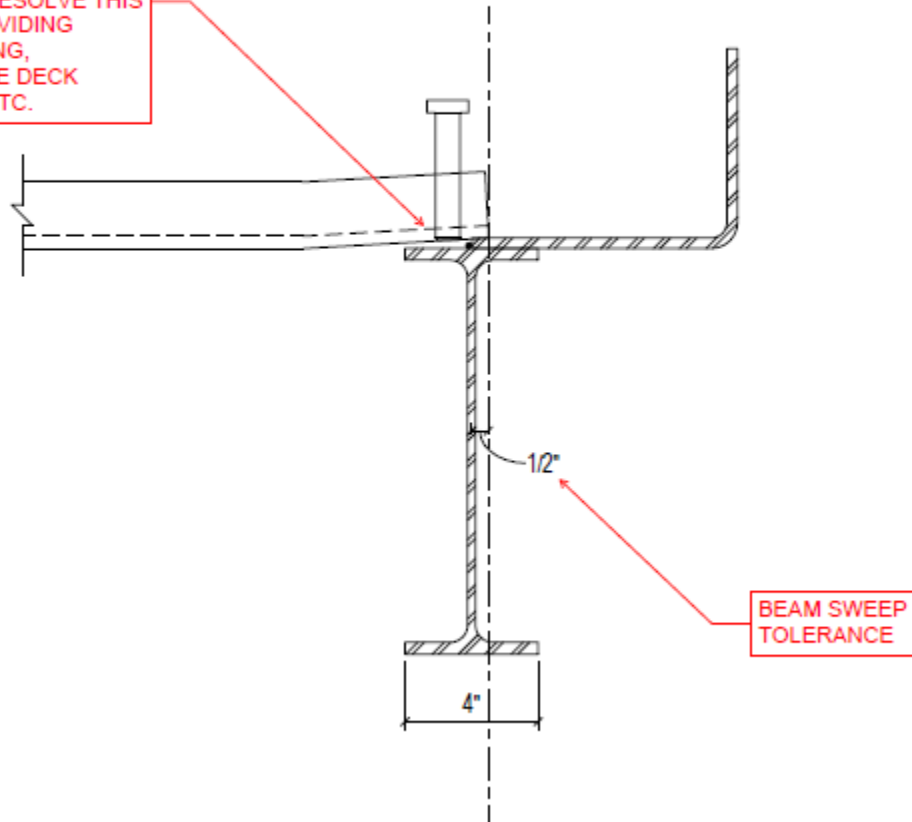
Deck Bearing at Composite Perimeter Beam - As Built Within Tolerance
